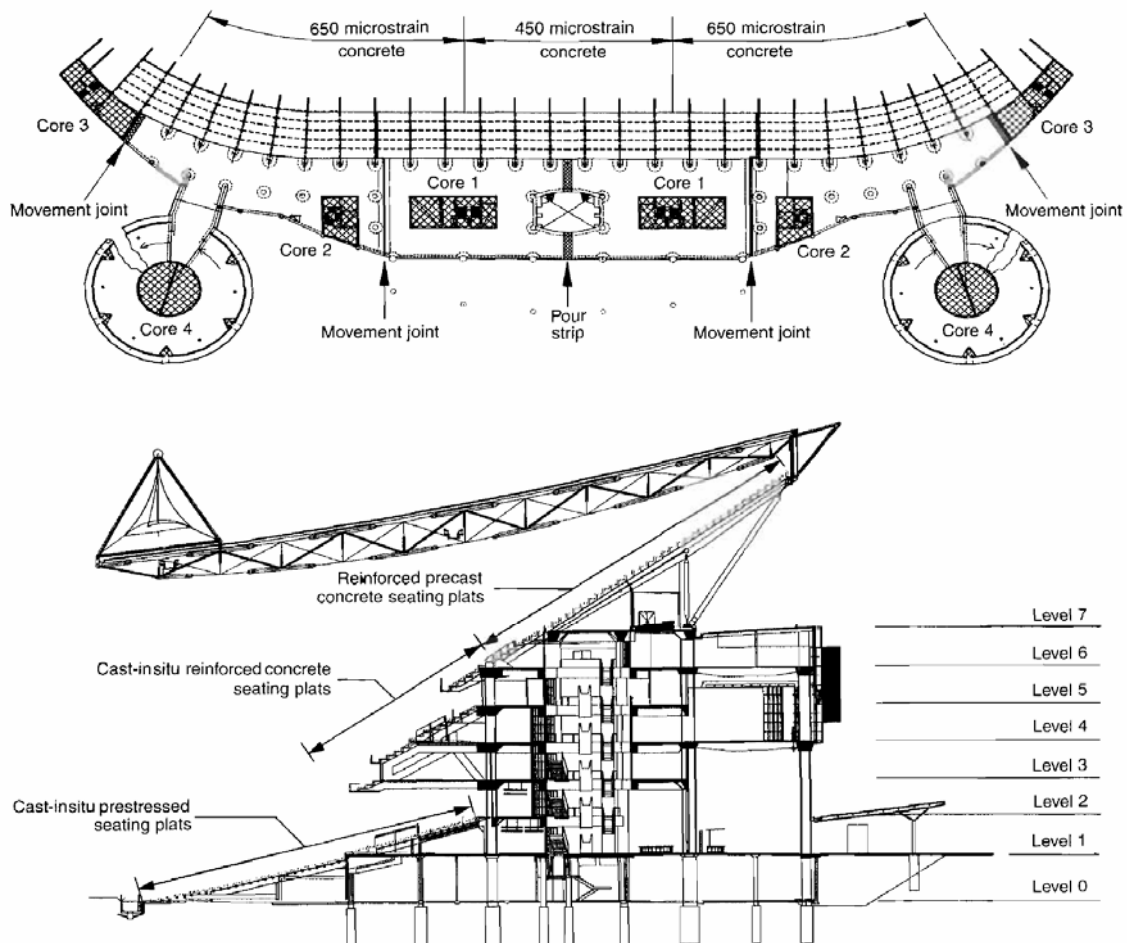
Telstra Stadium*: A ground plan and a cross section of a section of the lower retractable seating tier and the cantilever mid-tier. [5]
